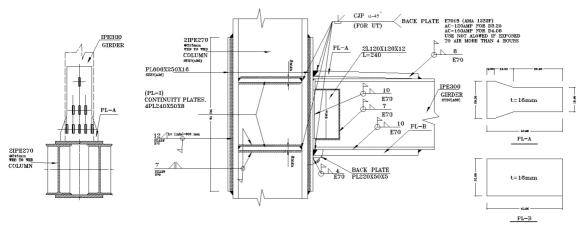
Specimen 2- Cover Plates connected to an end plate welded to a Double profile Column
